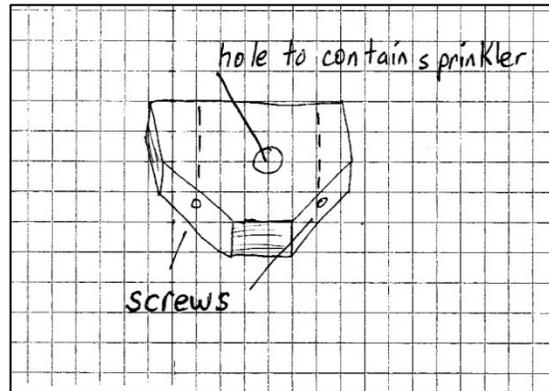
Carpenter designed wood sprinkler cradles for attachment to the roof eaves.
